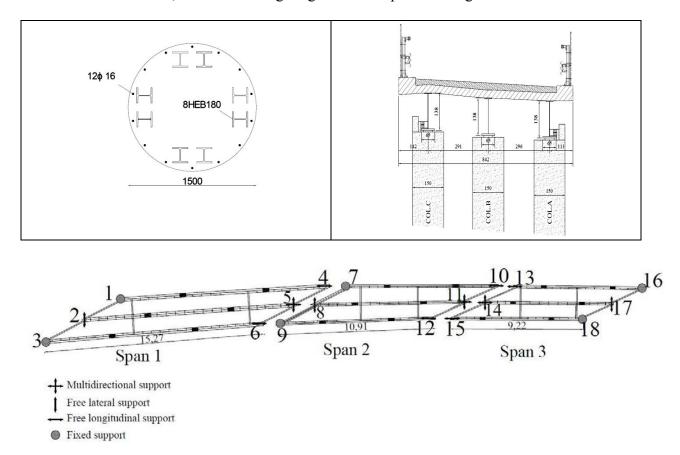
Pier section, cross section of the longer span, plan of the deck.
